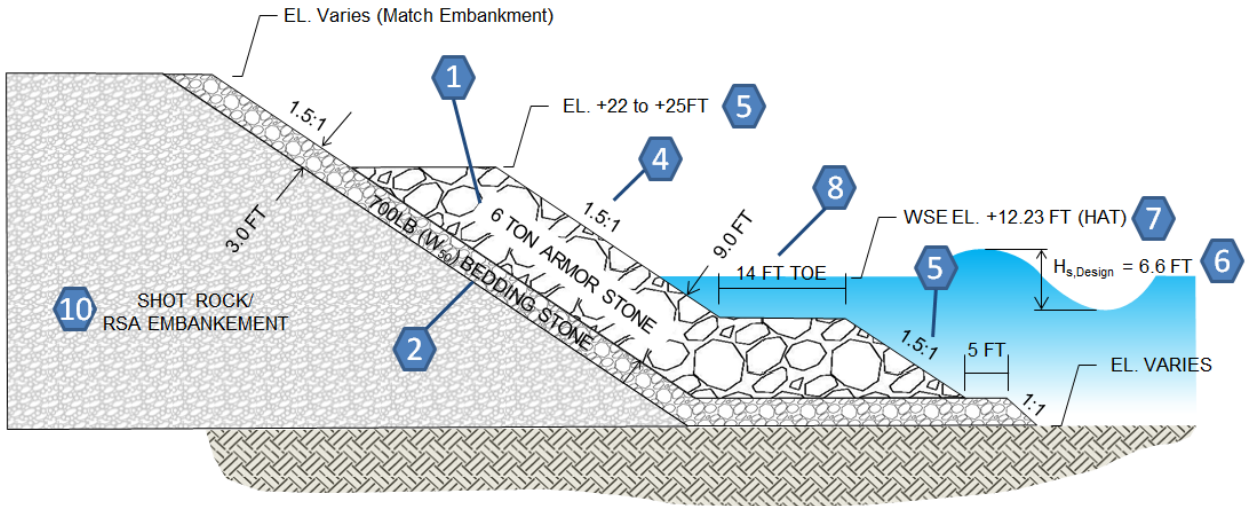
Runway 25 Preliminary Design Cross-Section at Deepest Condition (Stone Revetment Option)
